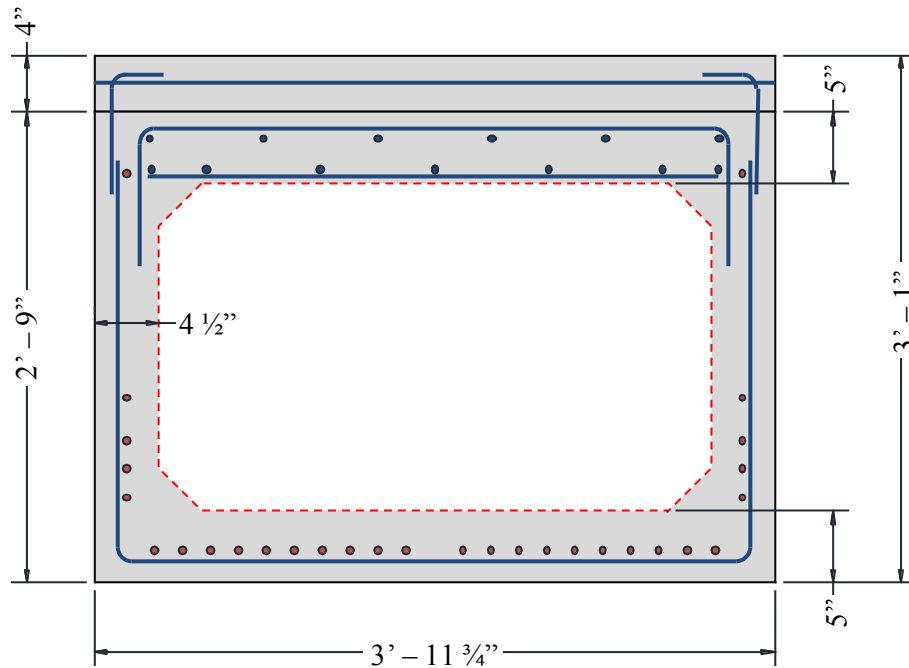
Box beams tested by Saiidi and Bush (2006)
